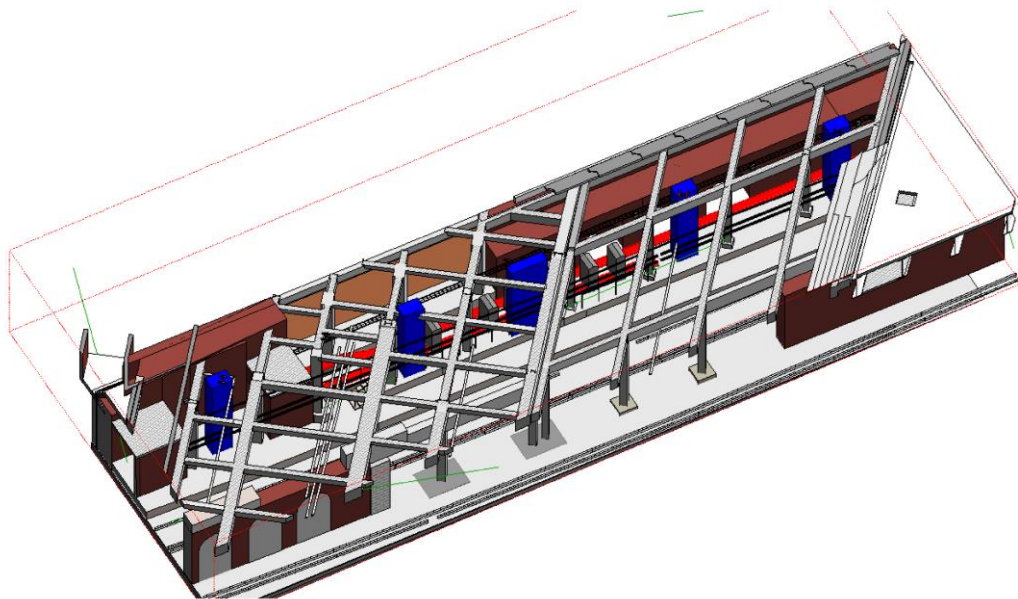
Railway Tunnel with Columns in BLUE adjacent Up Snow Hill
